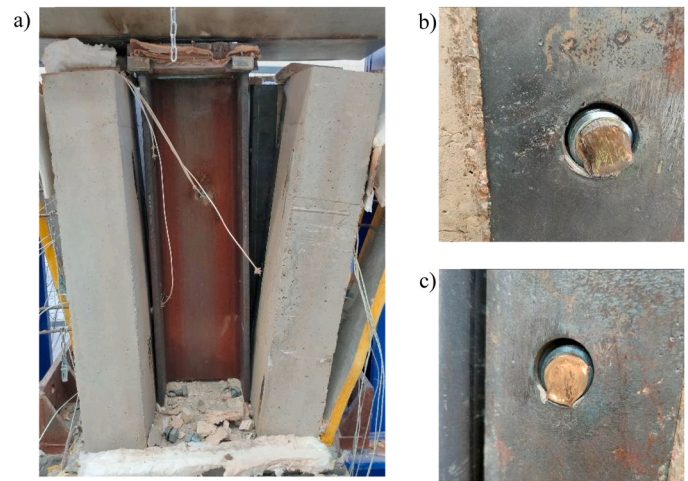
Test P15.1-T300: a) specimen after failure; b) and c) details of bolts after shear failure.
